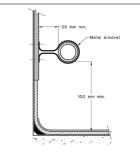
TYPICAL CLEARANCES FOR SERVICE PIPES AND CONDUITS
